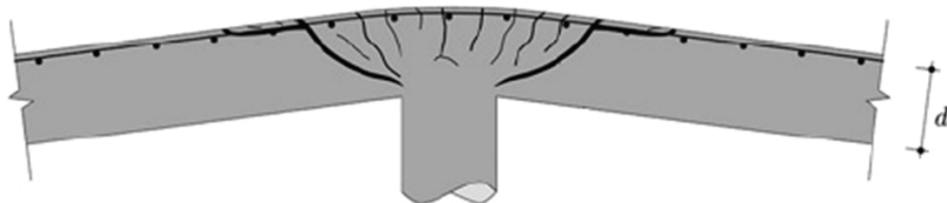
Punching shear failure mechanism observed in reinforced concrete flat slabs [75]
